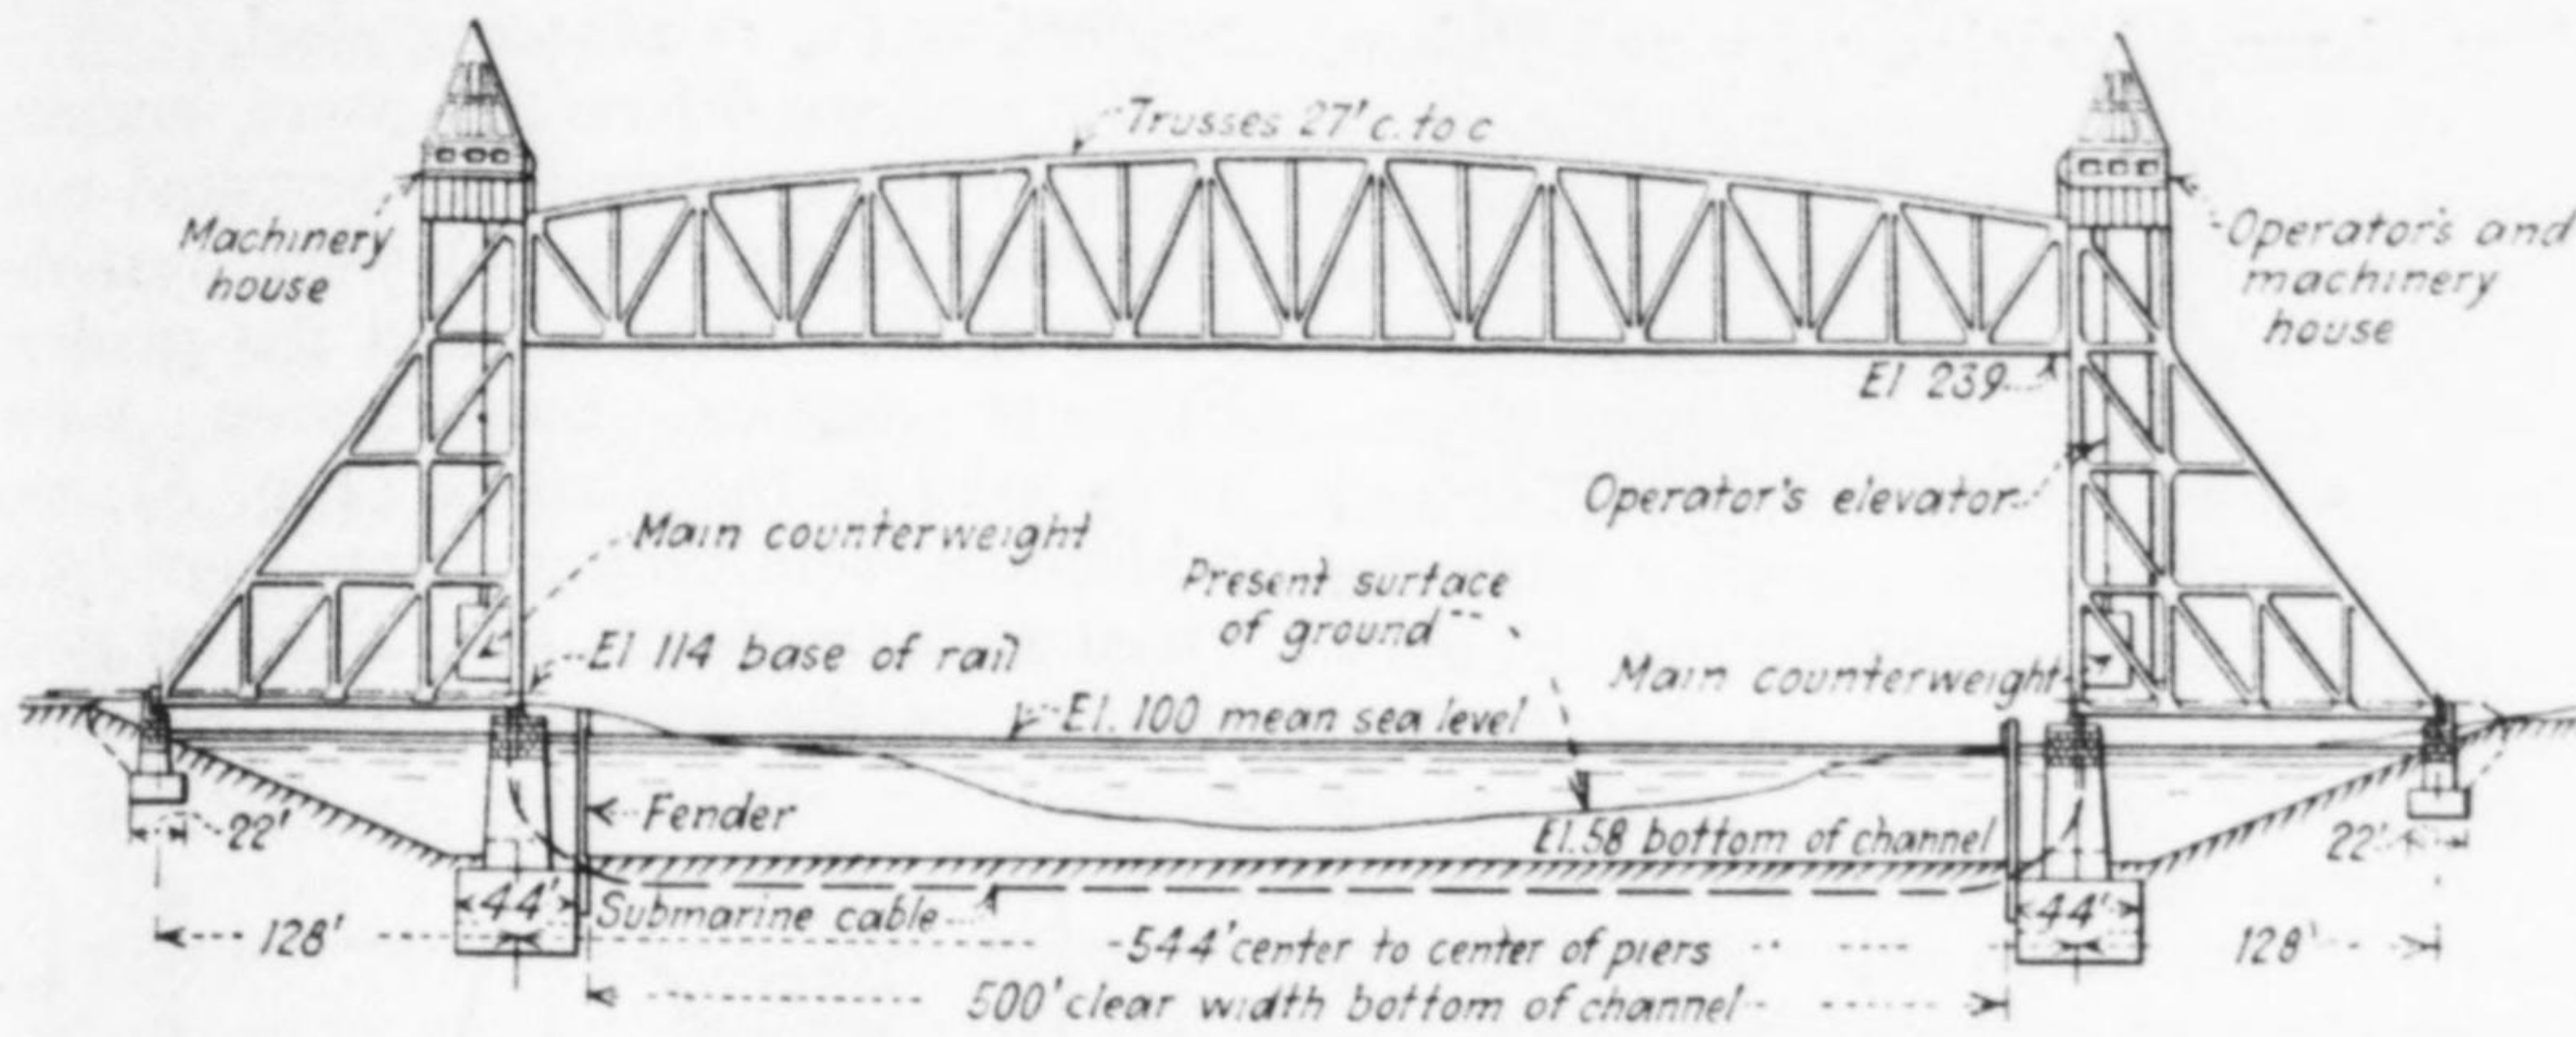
THE RAILROAD BRIDGE over the canal will be the longest vertical-lift span yet built, 544 ft. c. to c. of piers.
